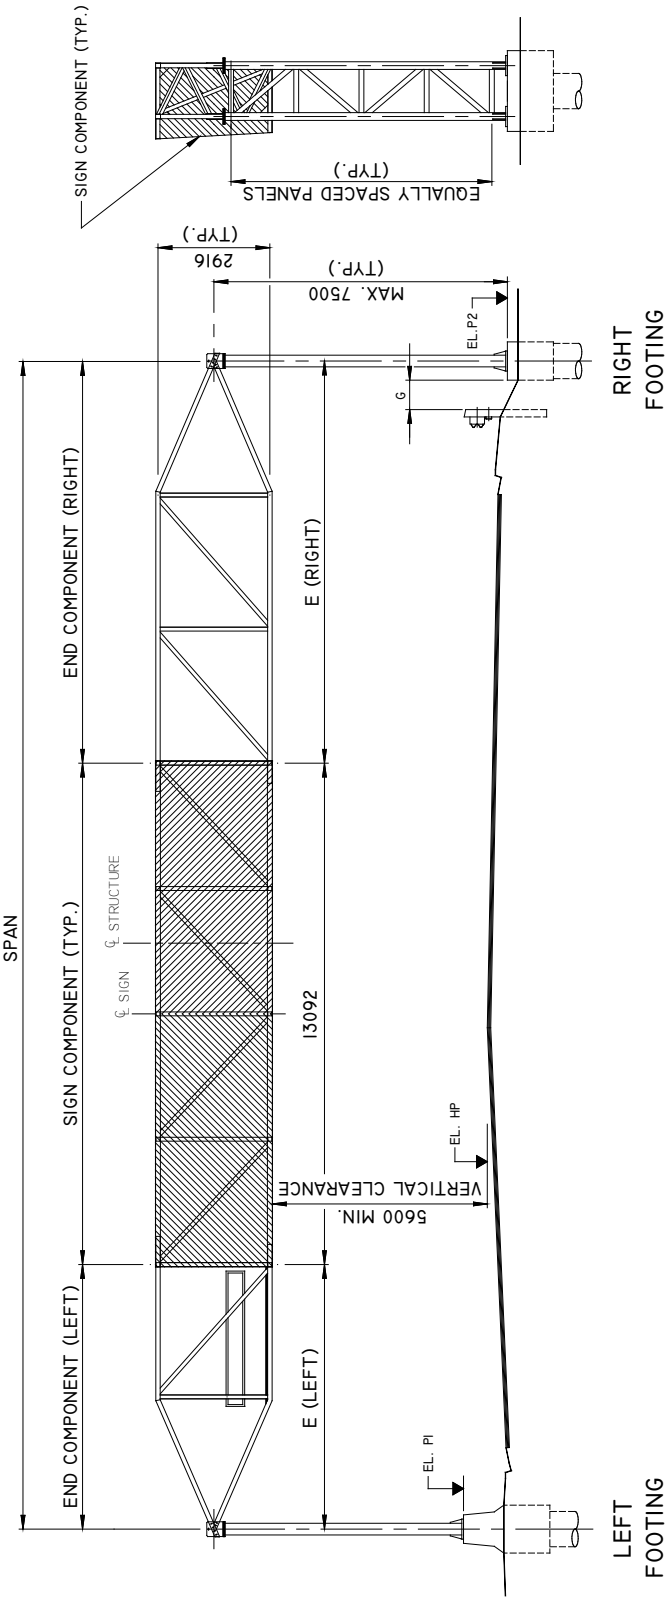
(b) TYPICAL VMS OVERHEAD TRUSS SUPPORT ELEVATION
